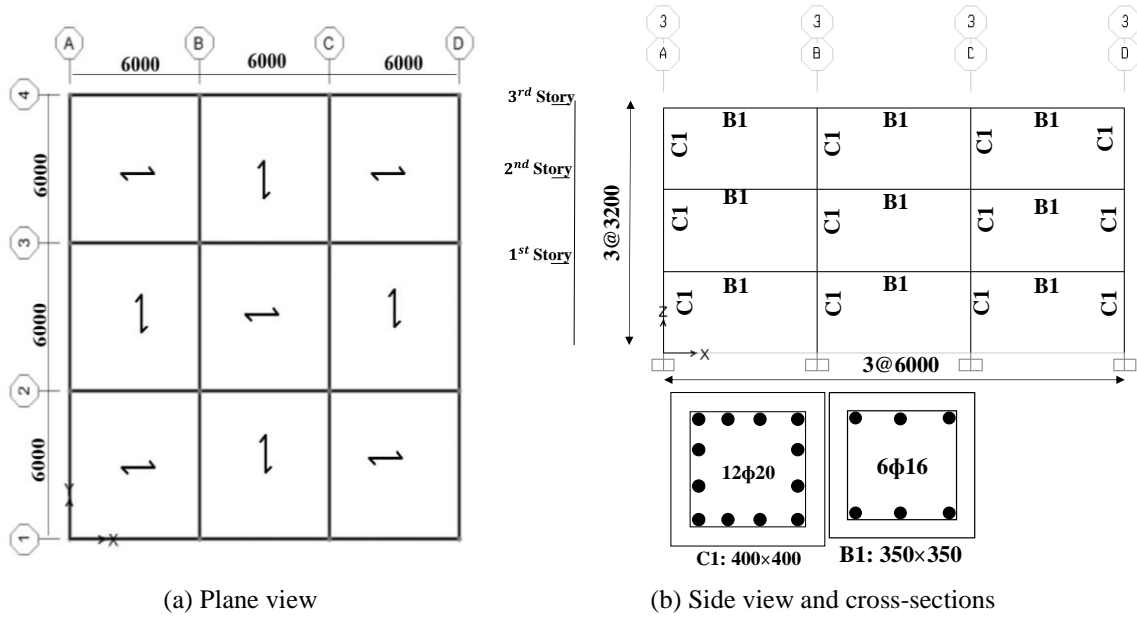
The plan and side view of the reference structure (dimensions are in mm)
